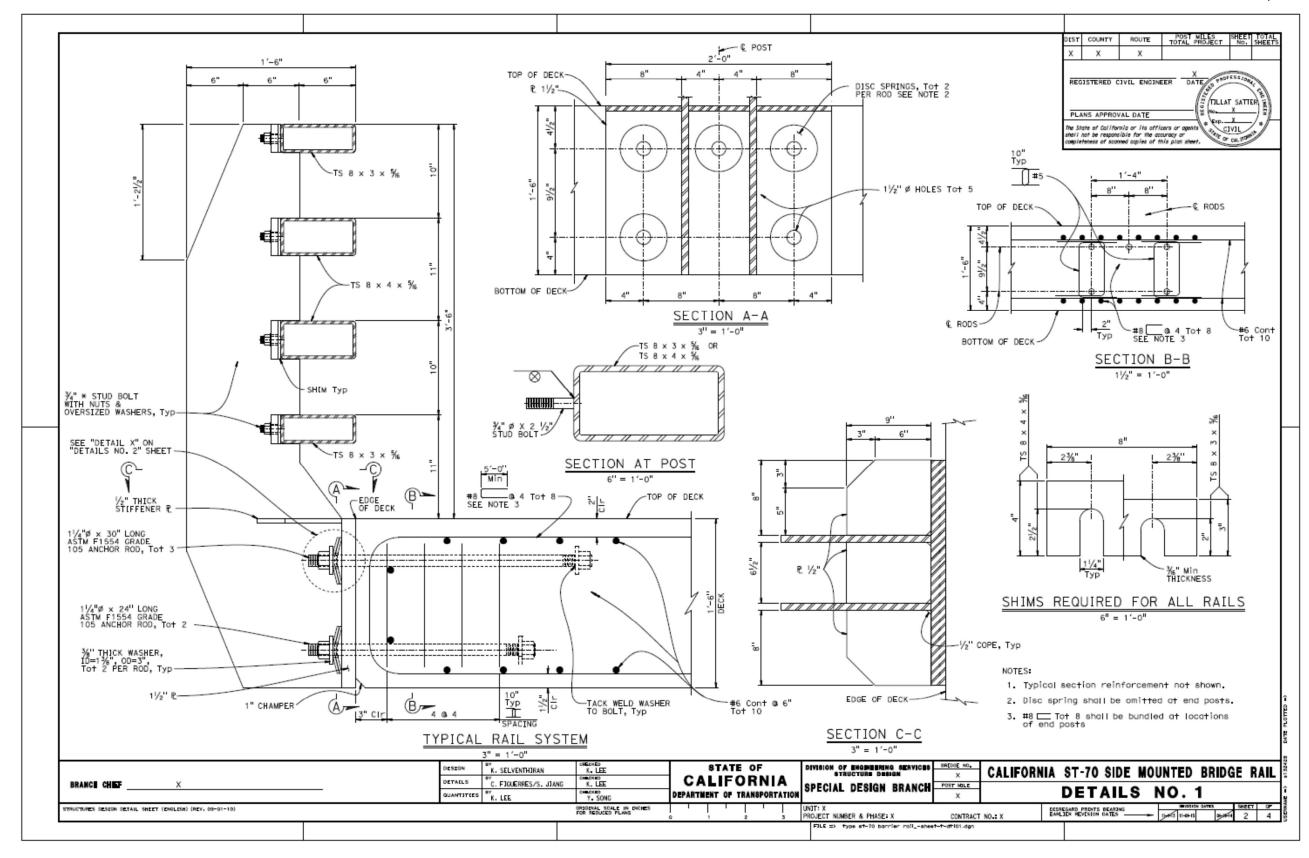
CA ST-70SM Side Mounted Bridge Rail (Details Page 1)
